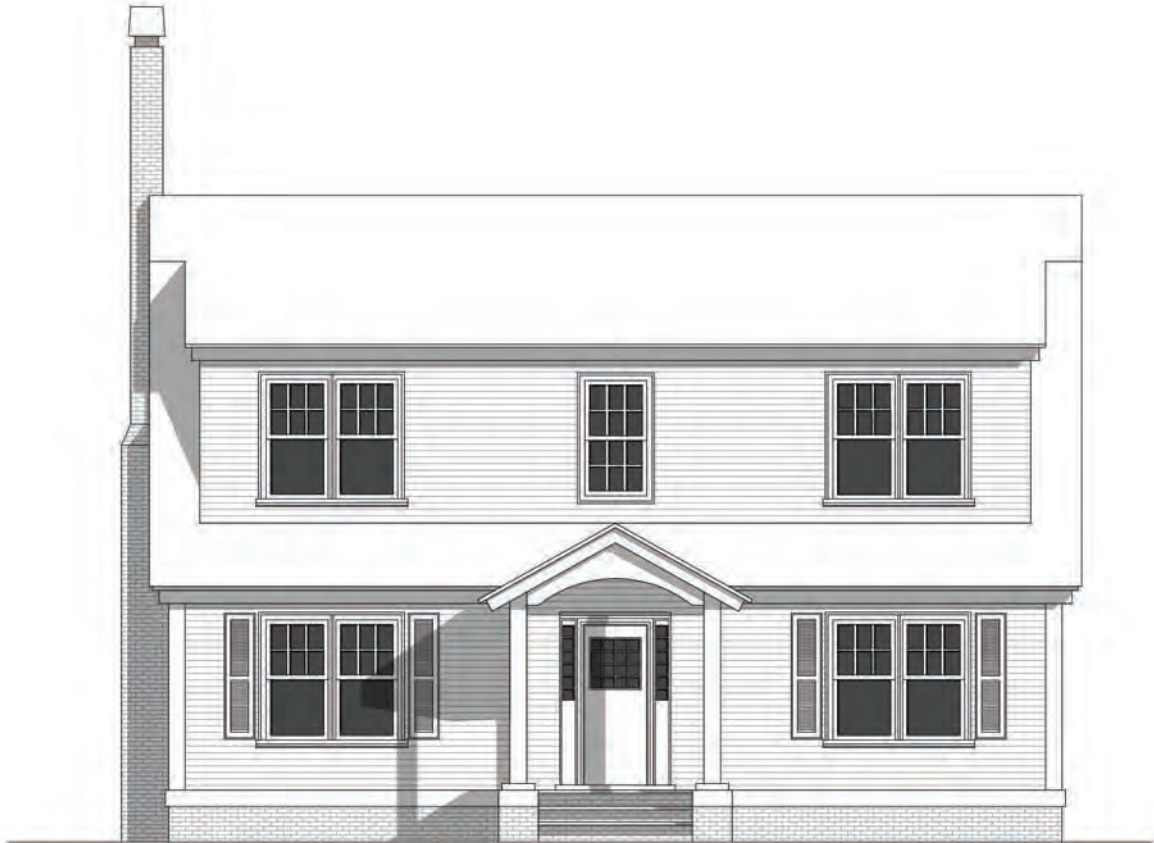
Facade Conditions from Dutch Colonial House Style
